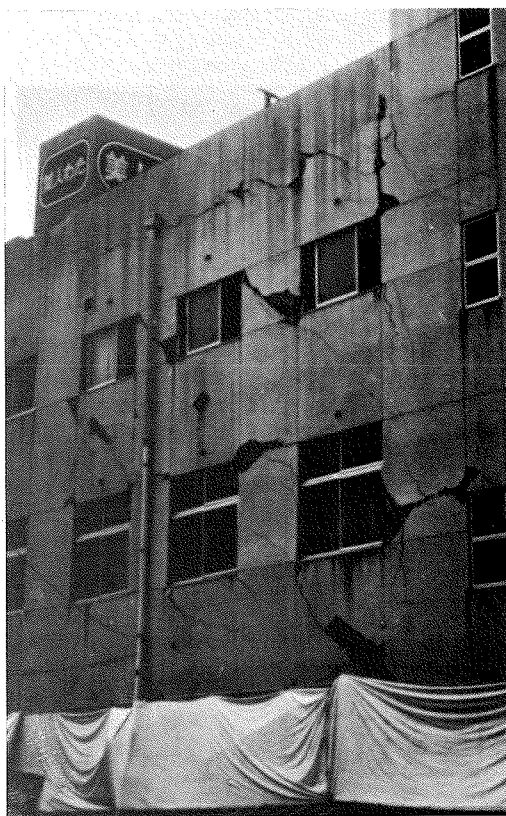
Kinoshita building, Oroshicho area, Sendai: view from the east (rear). This 3-story reinforced concrete building is two spans by six and was completed in 1969. The two spans in the east-west direction are long: approximately 11.5 m each. The structure is essentially a frame building. The first-floor columns along the centerline of the building in the north-south direction failed. In addition, the transverse foundation of the structure settled 10 to 15 cm along a middle column line, contributing to the extensive diagonal cracking. (Photograph courtesy J. D. Cooper)
